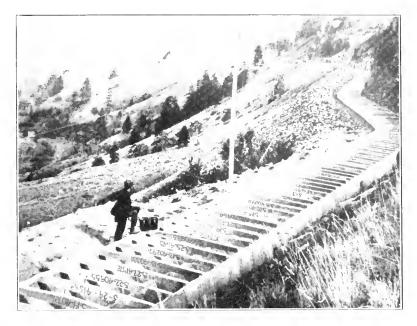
THETON MAIN CANAL, CONCRETE LINED.
